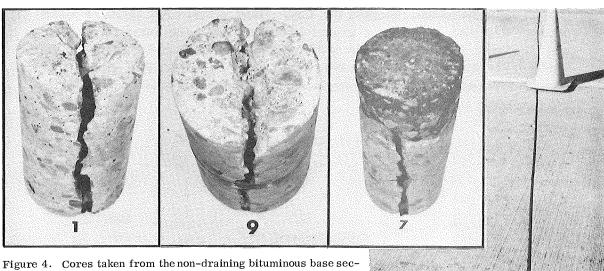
Cores taken from the non-draining bituminous base sections of the Clare Test Rd. The pavement was four years old when sampled. Core No. 1 is from an unfaulted westbound section, the other two are from the faulted eastbound section. All show the same heavy surface deterioration, evidently due to freeze-thaw action while standing in water. The faulted joint shown is the one from which Core No. 7 was taken. Note also the open shoulder-pavement joint.
